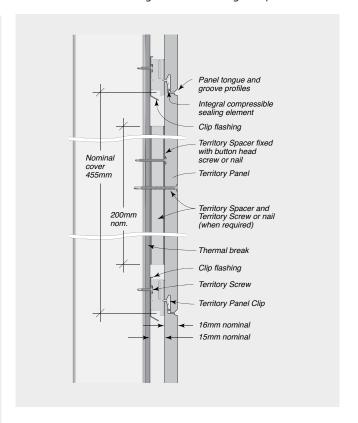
Typical Territory System Cross Section for Steel Framing – Elevation
